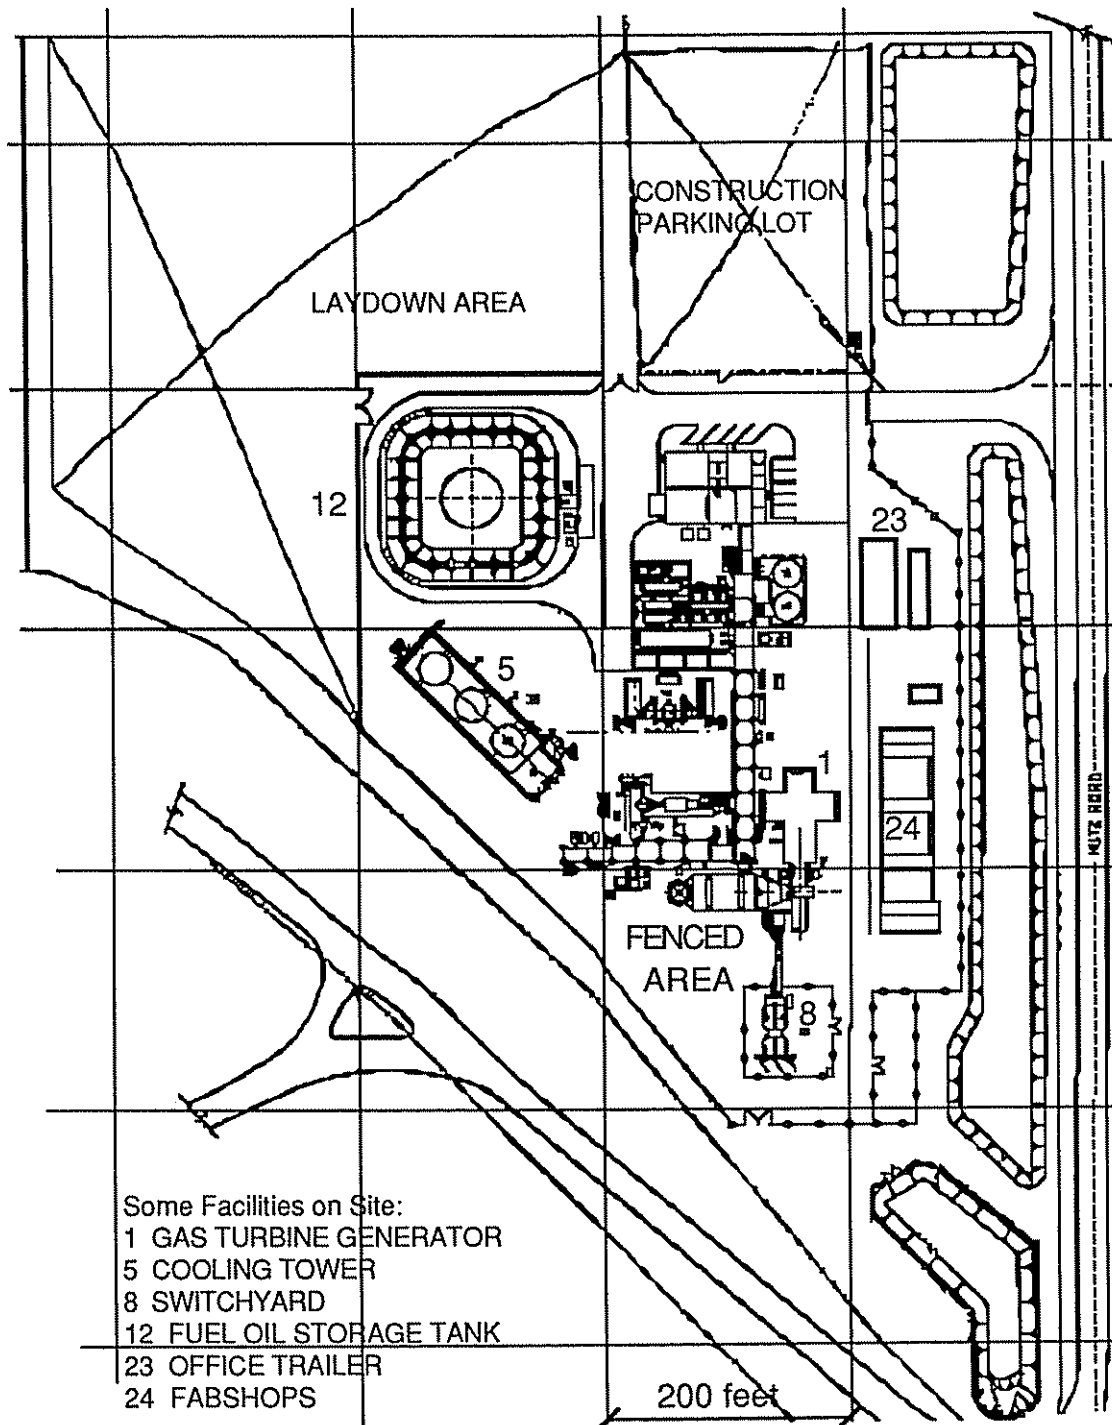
Fencing Plan of American 1 with some of the Temporary Facilities Laid Out by the Construction Manager
